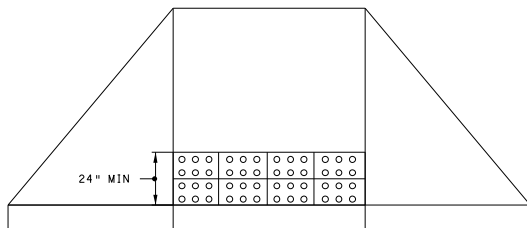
DETAIL ILLUSTRATES A TYPE 1 EXISTING RAMP REPLACED WITH A TYPE 2 RAMP. USE THIS DETAIL AS AN EXAMPLE TO REPLACE ANY RAMP WITH A DIFFERENT CURB RAMP TYPE.
